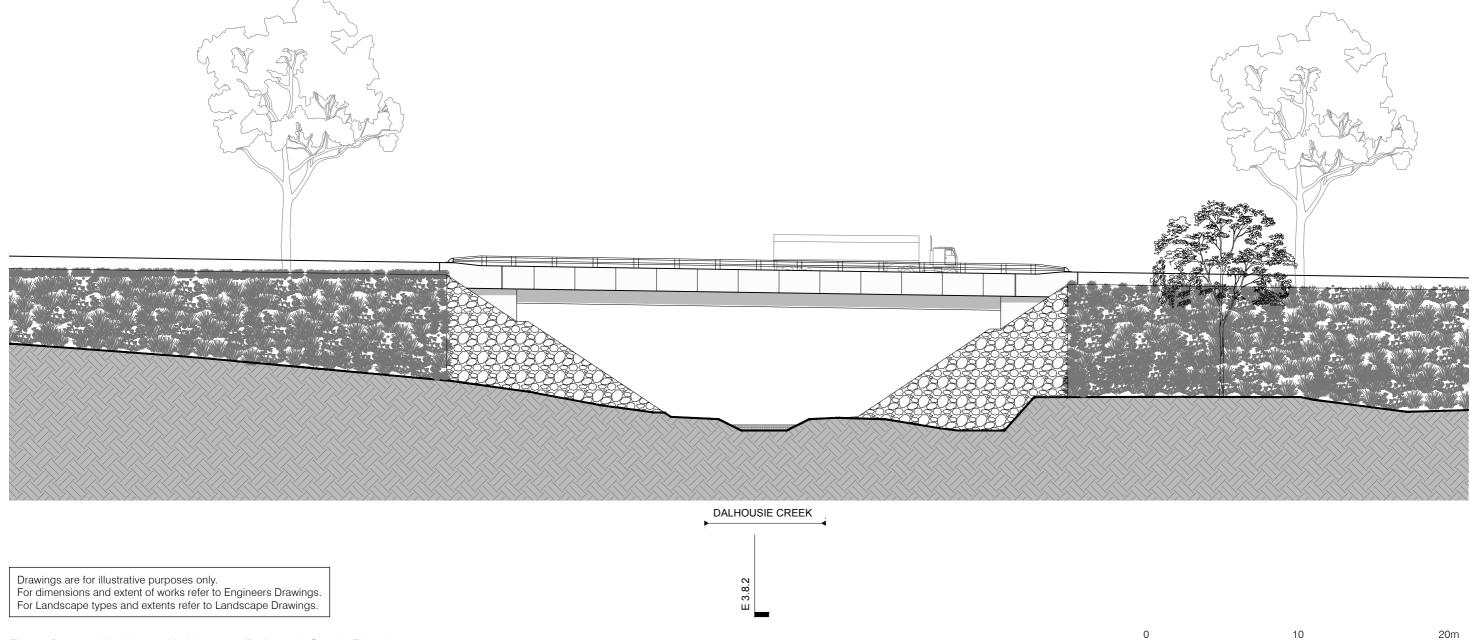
Northbound bridge over Dalhousie Creek: Elevation
